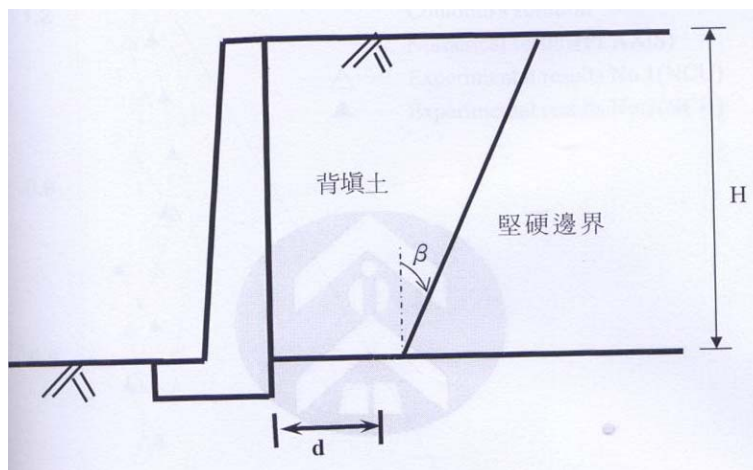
Typical space of backfill behind a retaining wall (after Fan and Chen, 2006)
